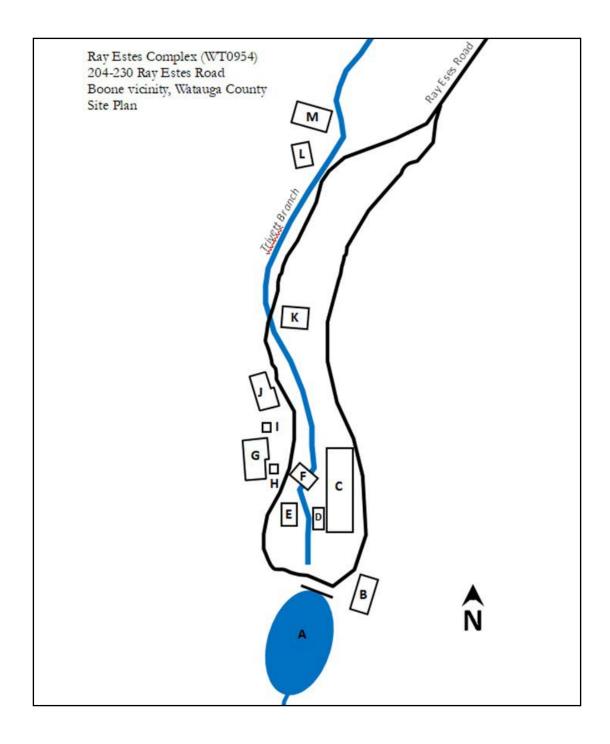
Site plan showing the layout of buildings and features at the Ray Estes Complex (WT0954), with labels corresponding to the description in Section 12.0.
